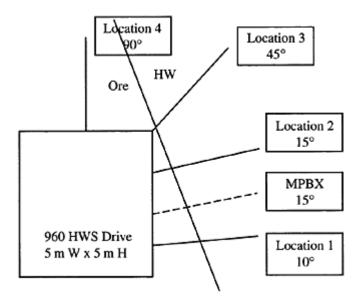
Cable layout for 960 HW south test section. Numbers refer to cable locations. View South (NTS).
